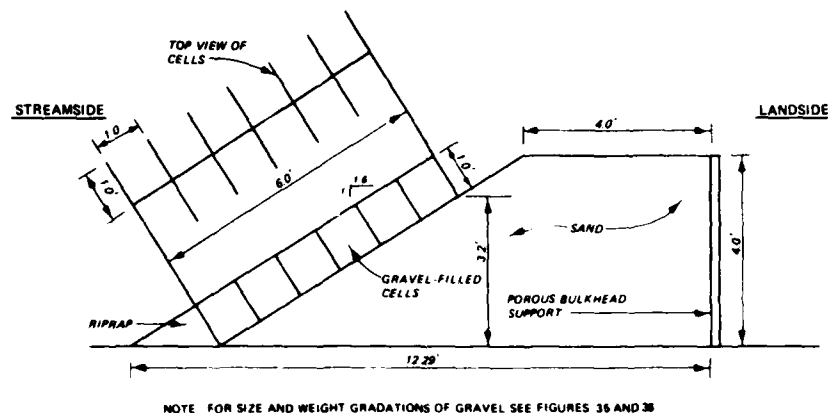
Plan 8A, sand streambank with gravel-filled cells protection
